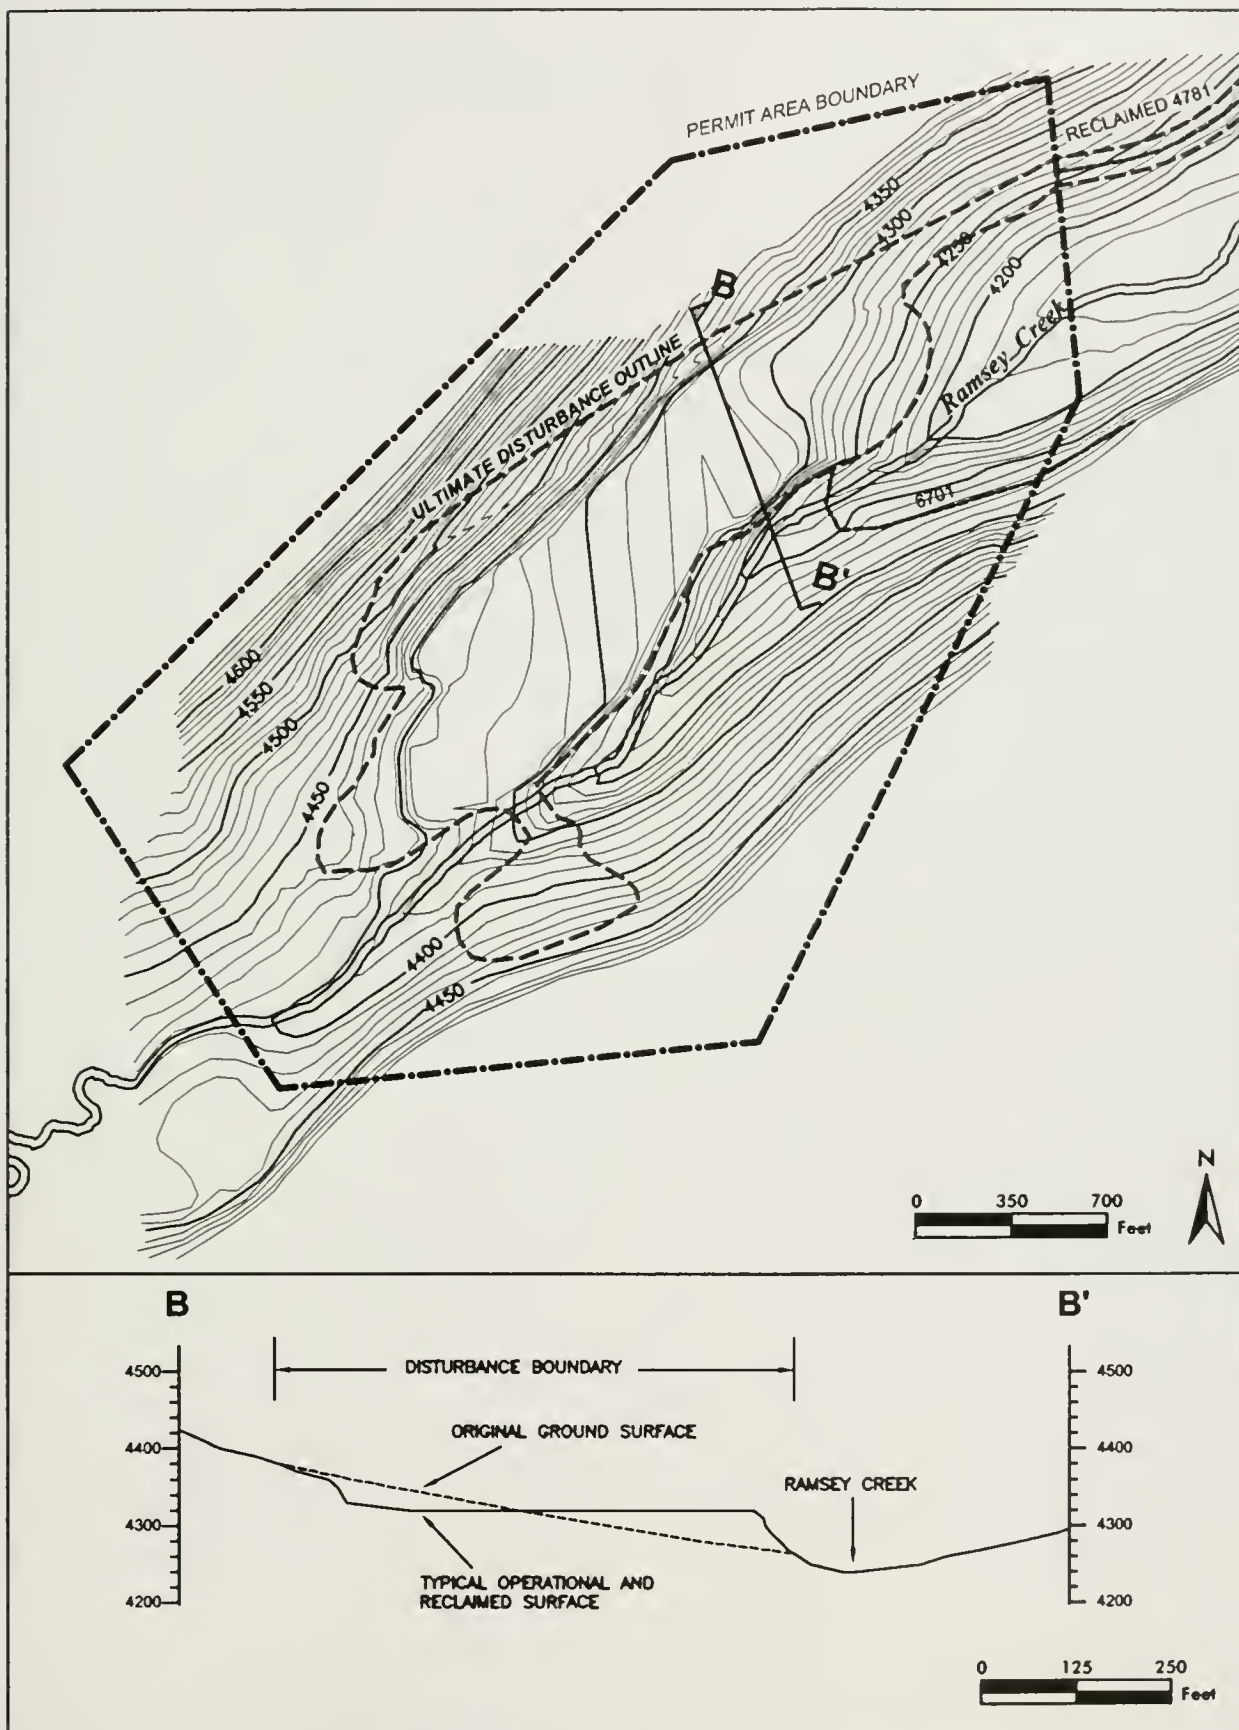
Post-mining Topography, Ramsey Plant Site, Alternative 2
